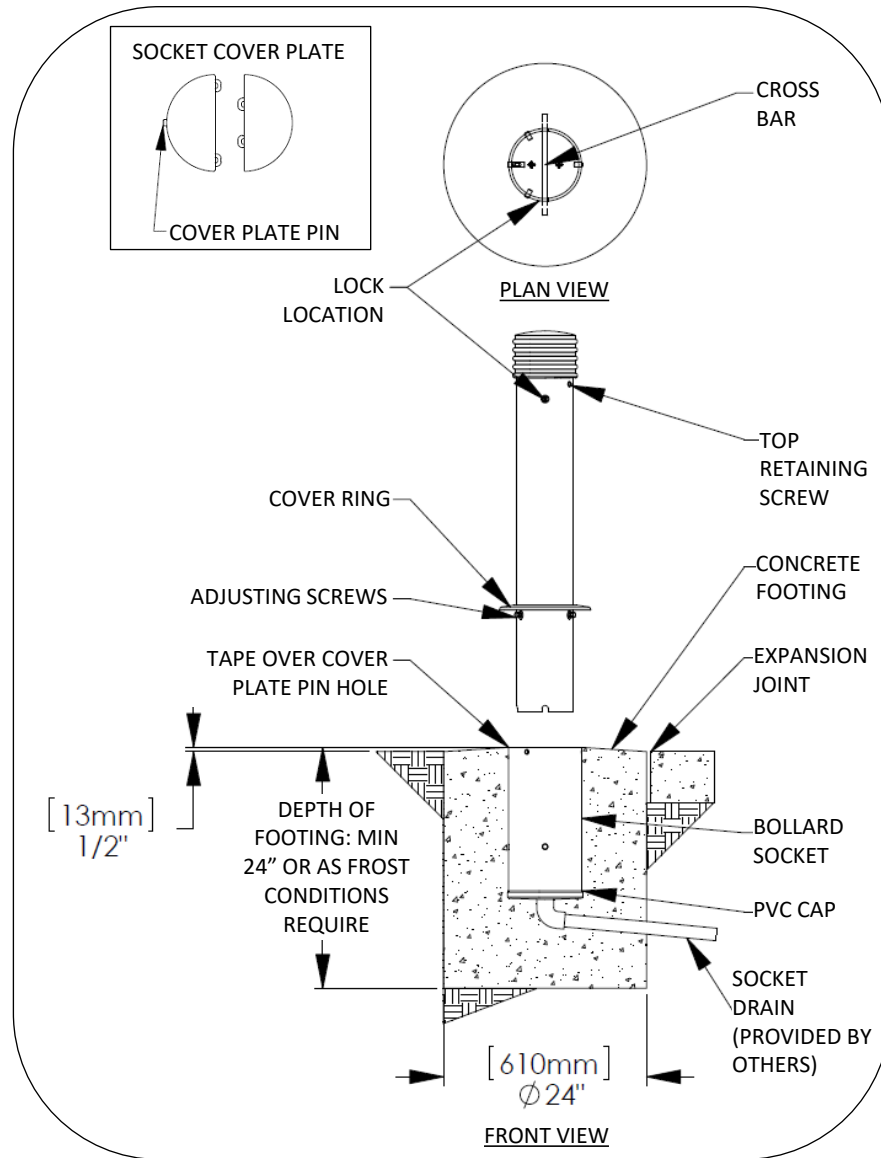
REMOVABLE BOLLARD ASSEMBLY
